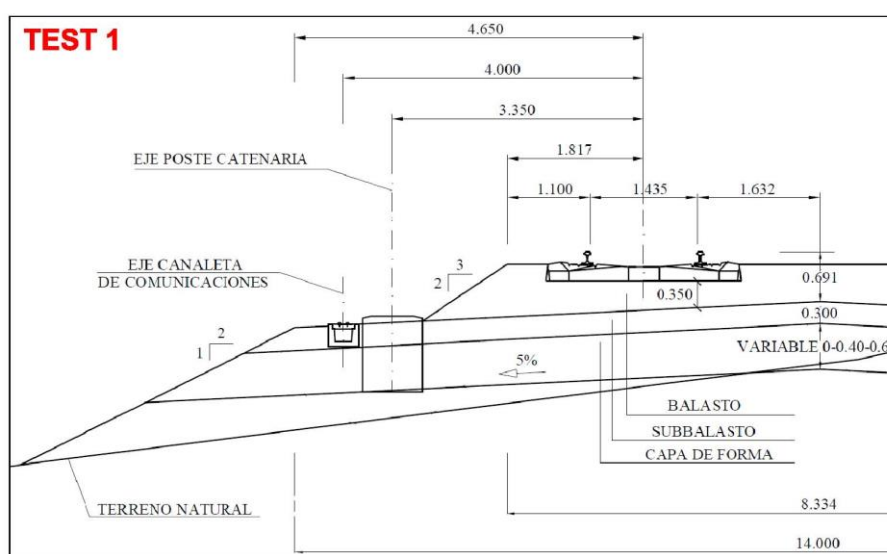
EXISTING RAILWAY CONFIGURATION TO BE USED IN TEST 1
